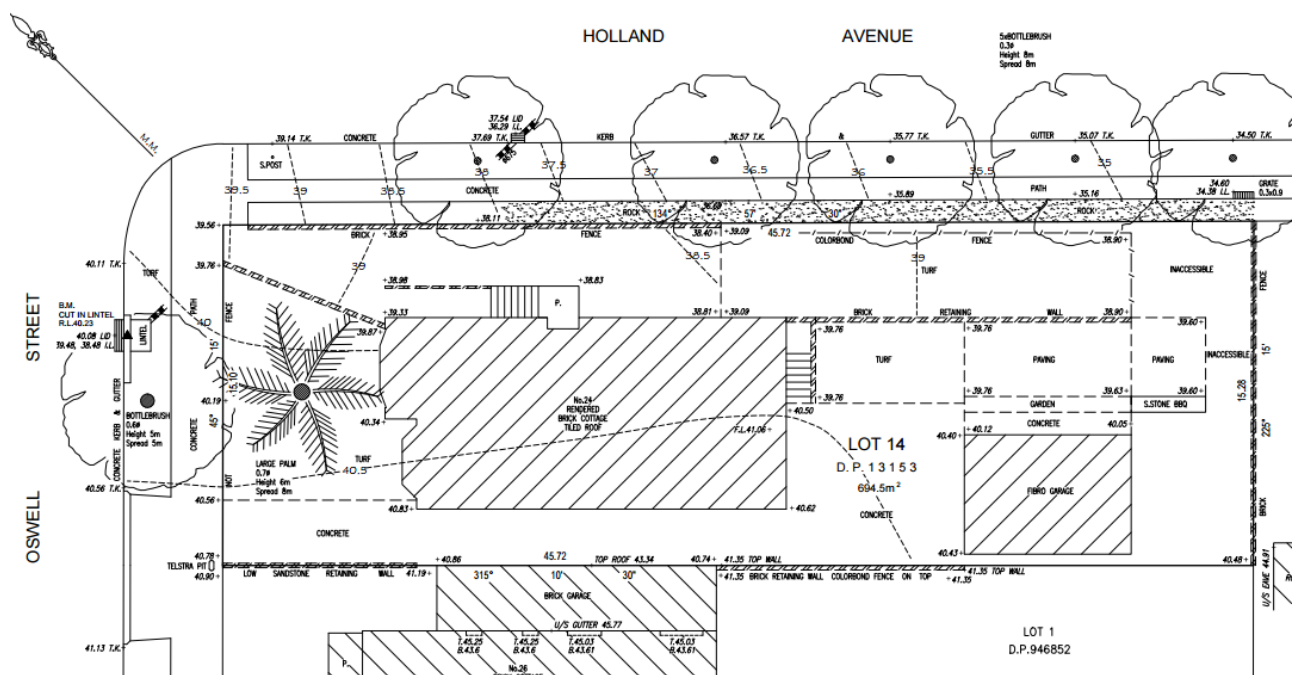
Extract of the Site Plan, illustrating dual frontage and allotment shape
